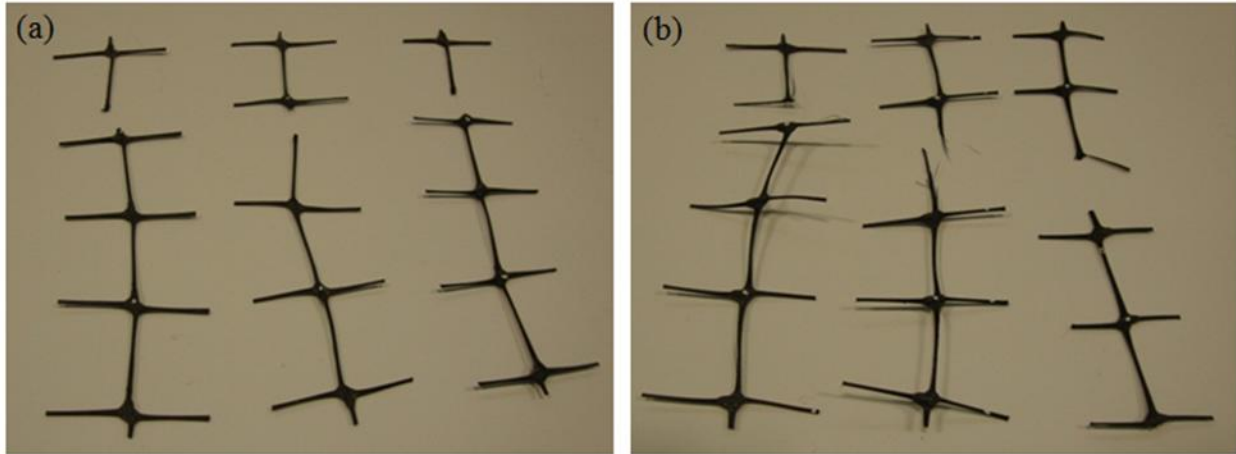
Damaged EGG2 (single layer) geogrid rib strength test specimens after the test: (a) machine direction, (b) cross-machine direction
